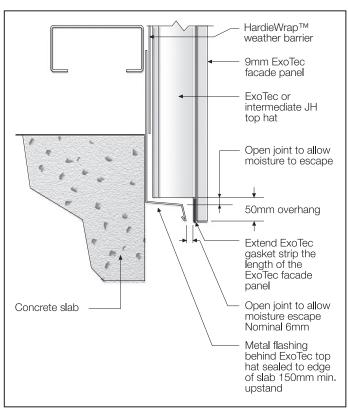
WALL BASE TYPICAL DETAIL 1
